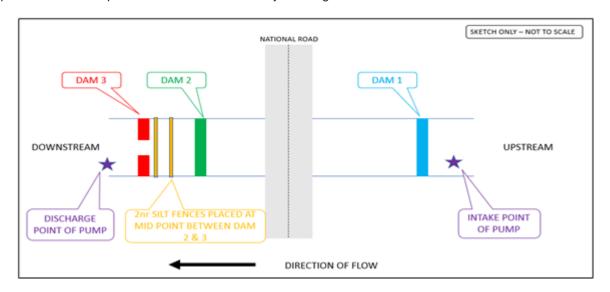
Schematic of three dam dewatering system proposed at Carrowrevagh Bridge
